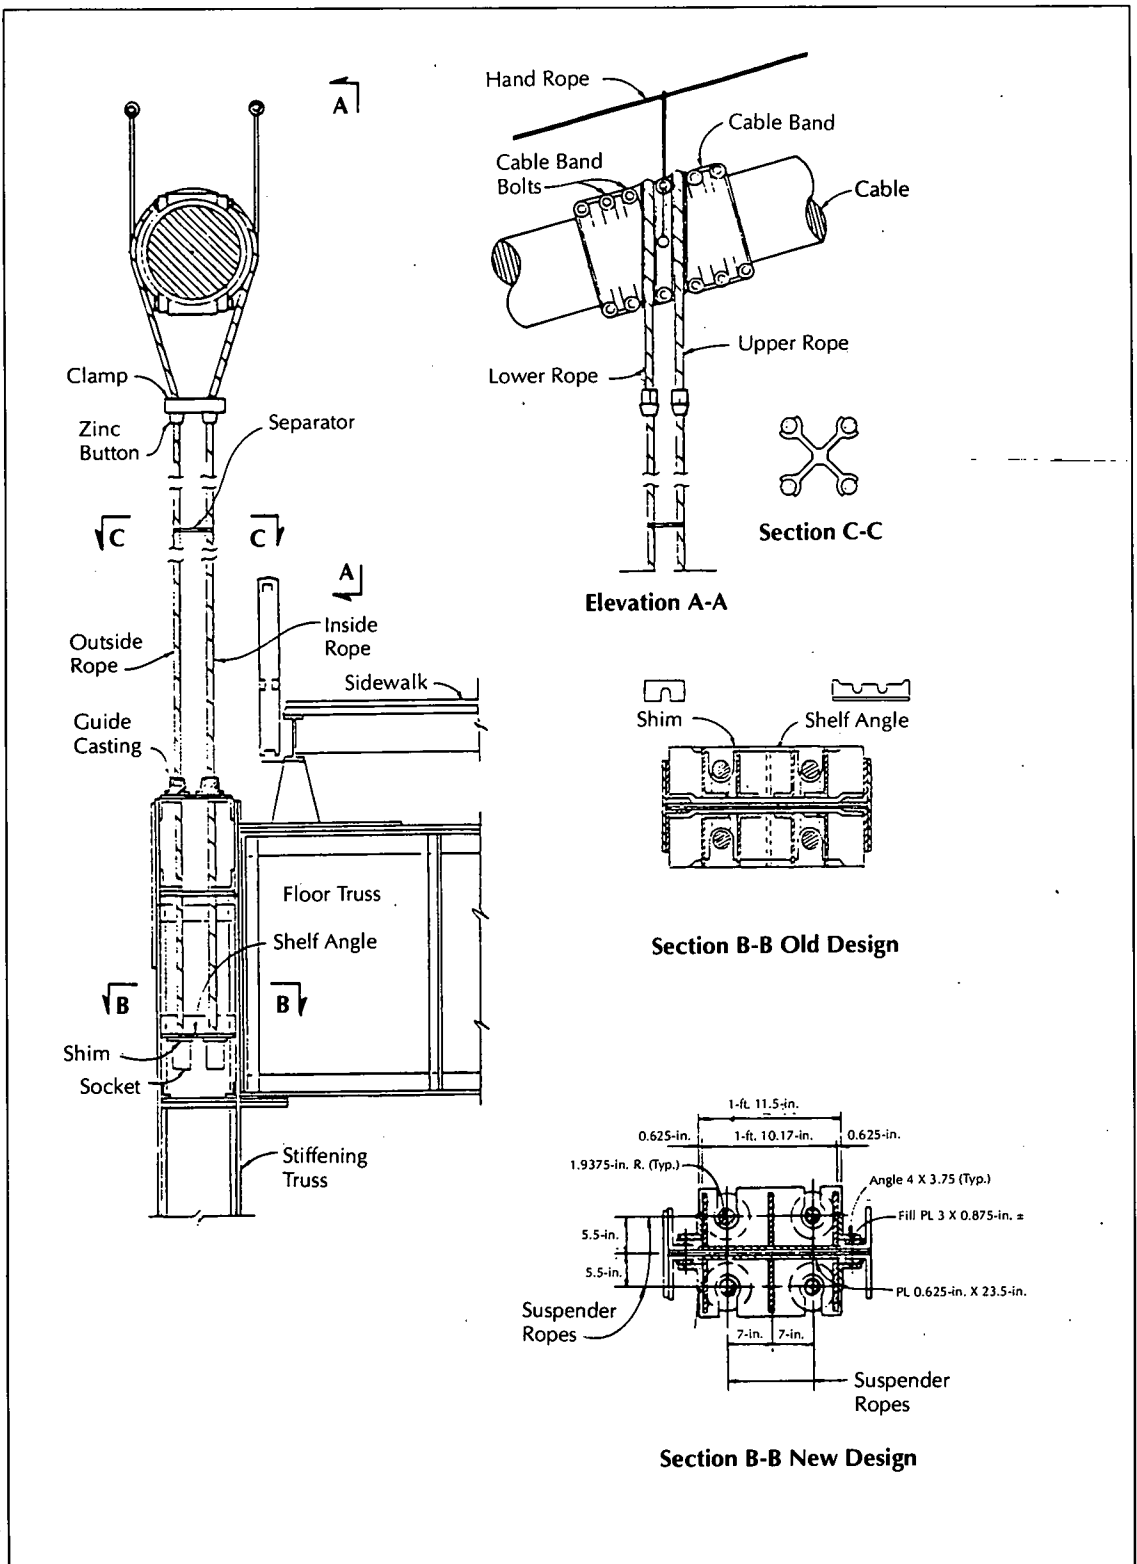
The suspender rope assembly for the Golden Gate Bridge.
